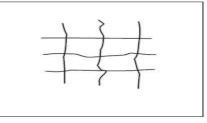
Cracks Due to Insufficient Concrete Cover
